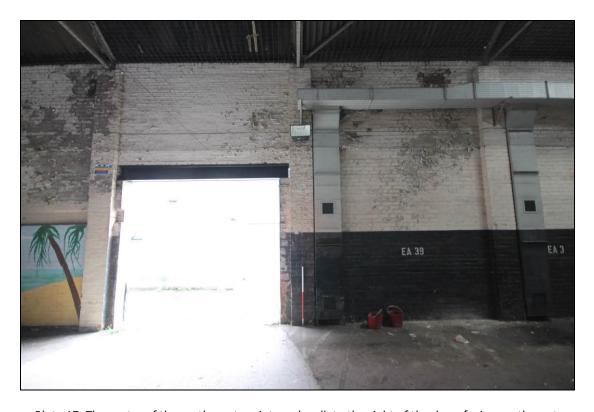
The centre of the north western internal wall, to the right of the door, facing north west.
